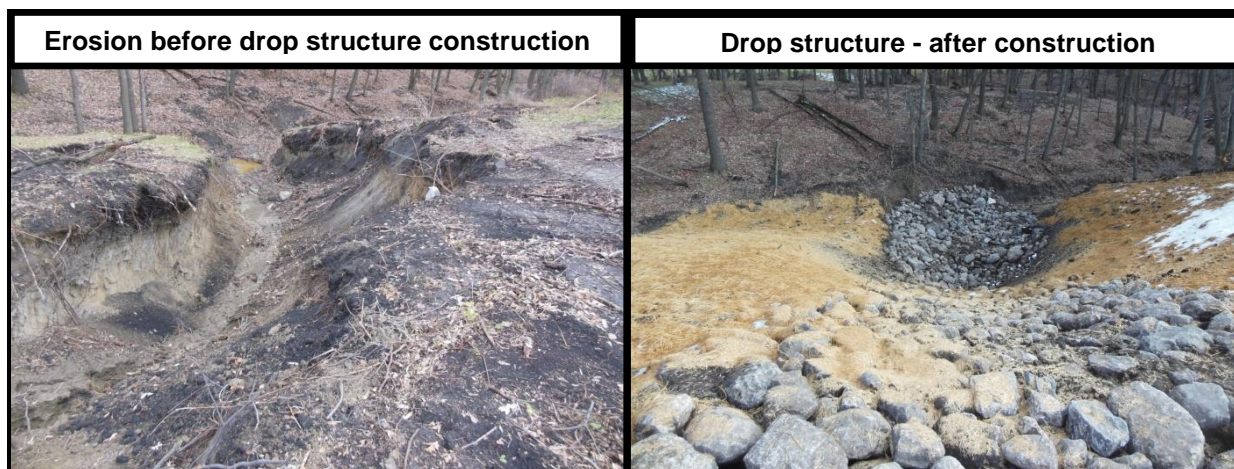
Example of a grade stabilization structure along an eroding drainage outlet along the Red Lake River.
